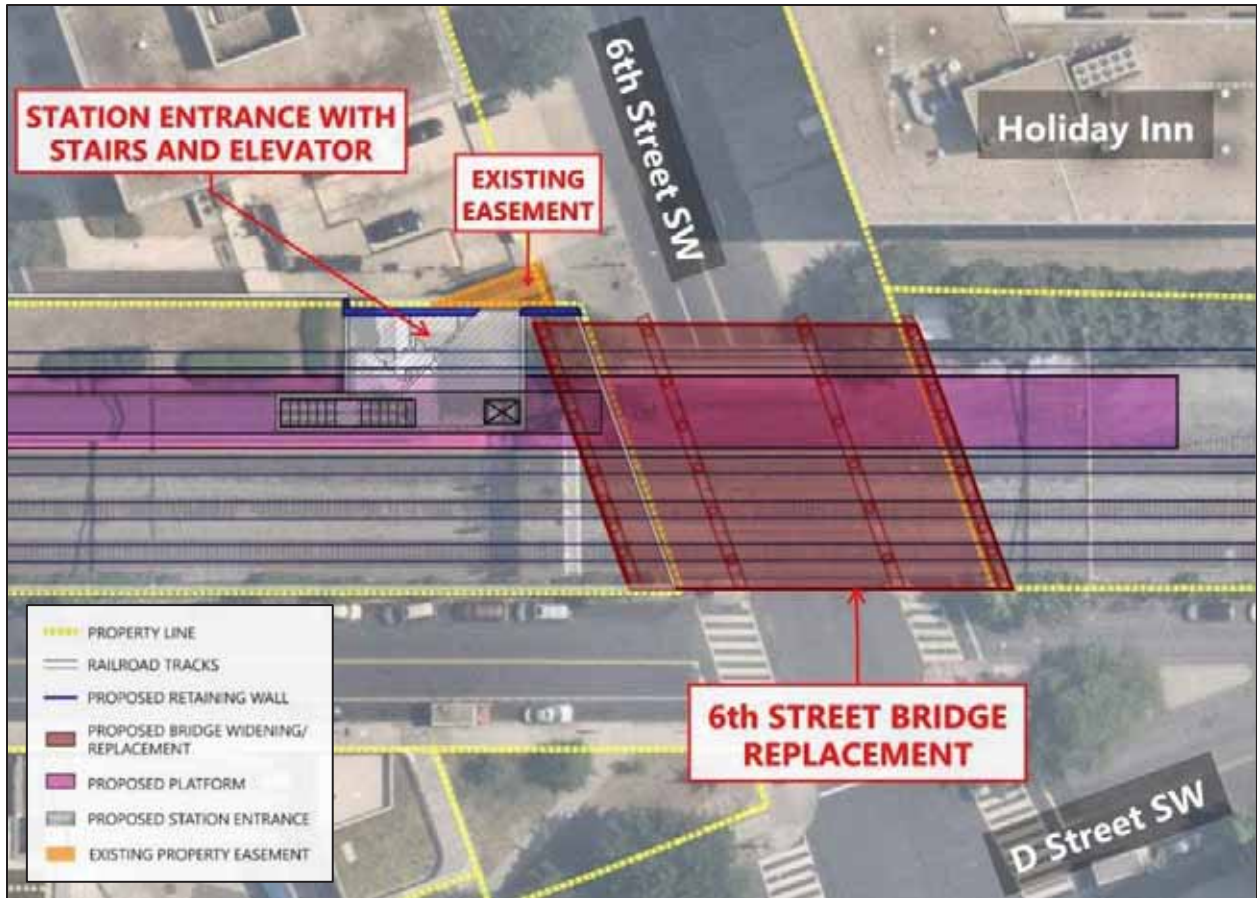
Site Plan of the Undertaking at the 6th Street SW Bridge
